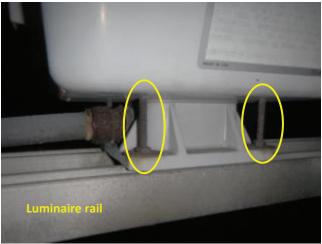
Corroded luminaire housing to luminaire track attachment bolts
